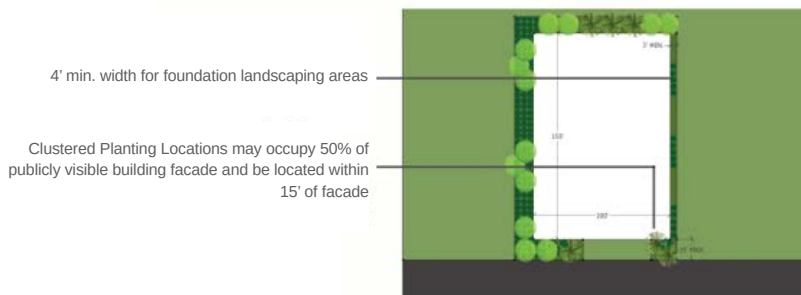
Building Perimeter Landscape Requirements Single-Use Residential (Above)
